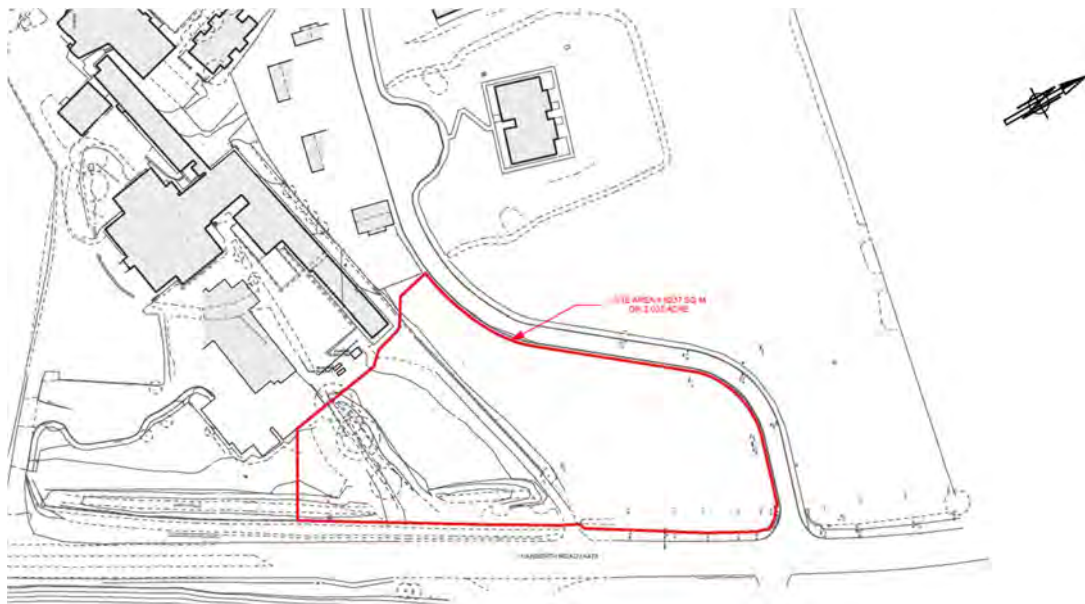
Extract of Site Location Plan (Site outlined in red)
